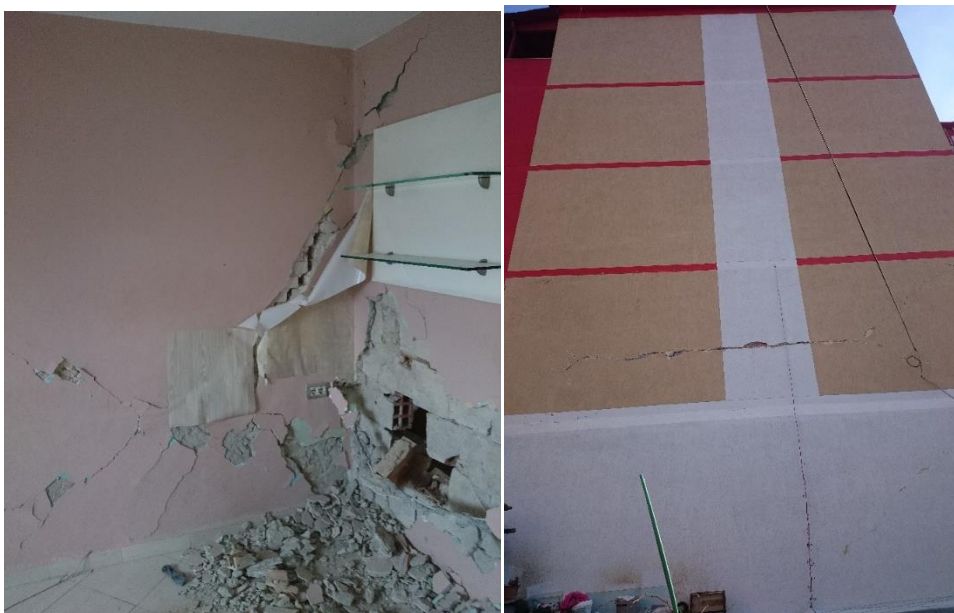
Heavy shear cracks (more than 3 cm separation) on load bearing walls and extensive damage on non- load bearing wall (left), serious damage observed on outer facade of the building in lower stories (right)
